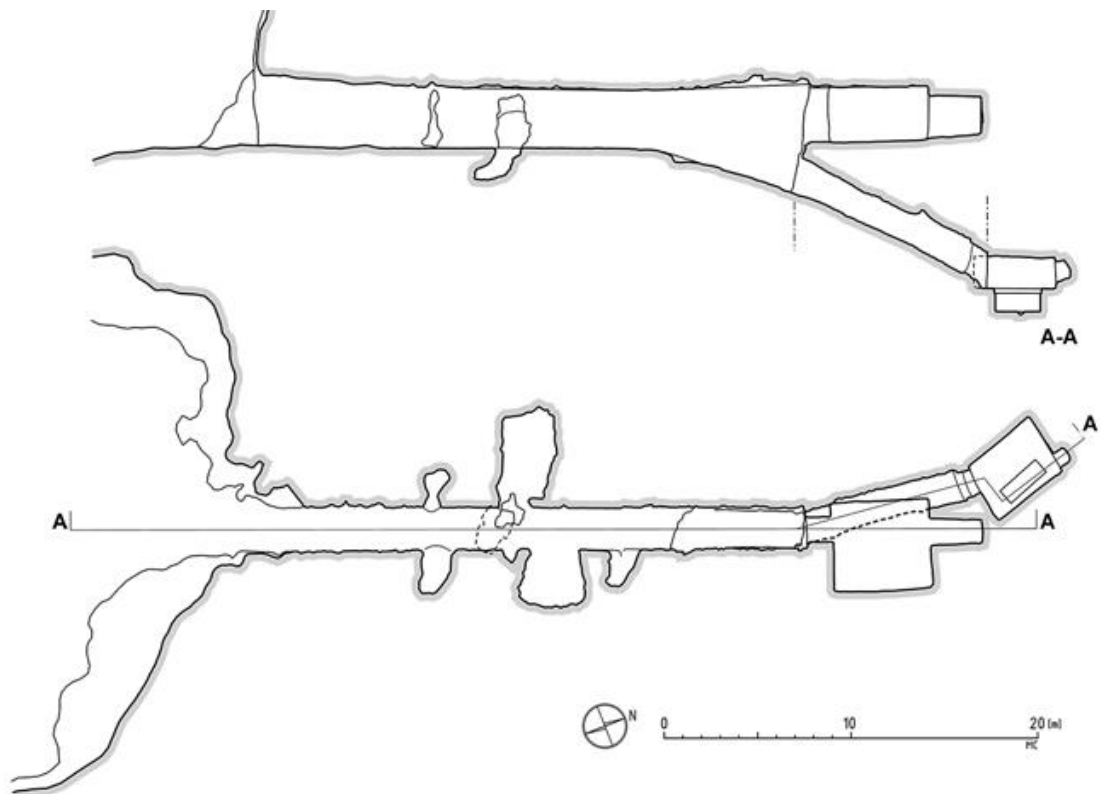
MMA 517 plan and section (Chudzik 2016, Fig.11)
